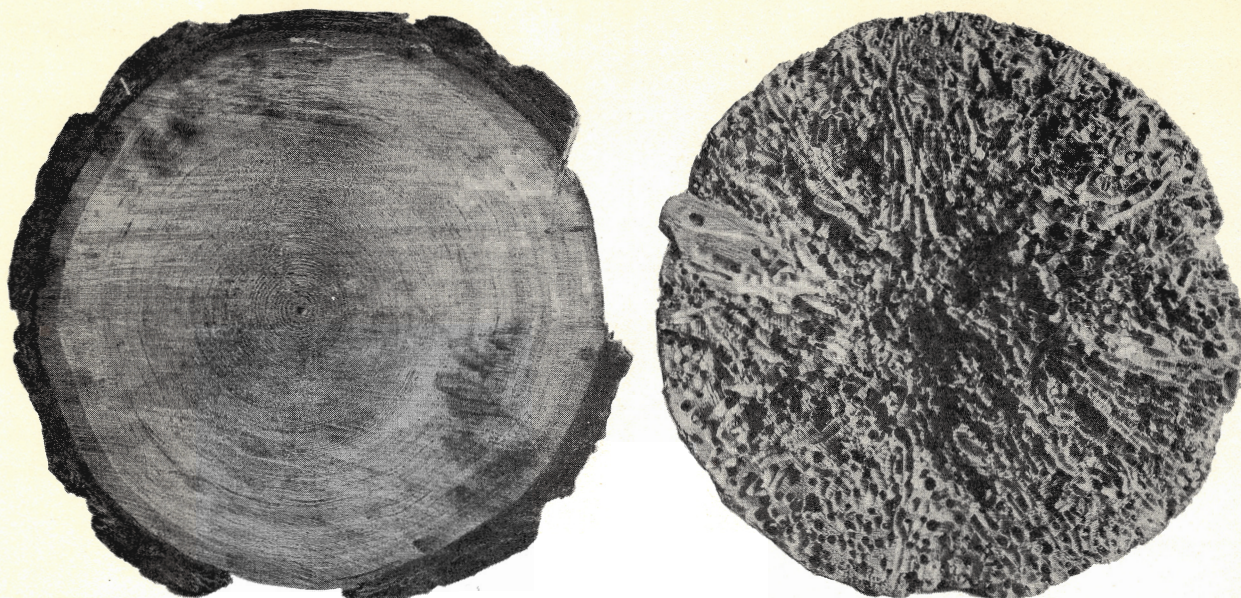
Section of Douglas Fir Pile Before and Following a Month's Exposure to Teredo. Burrard Inlet, B.C.
